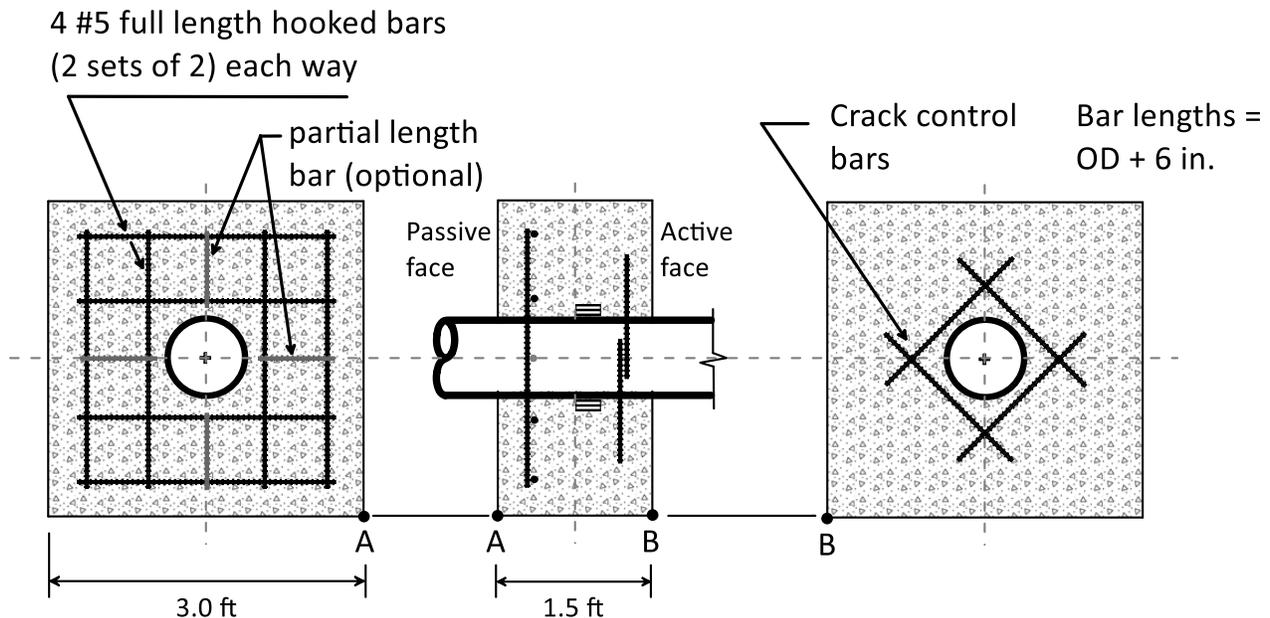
Anchor block reinforcement for 8-in. pipe example
